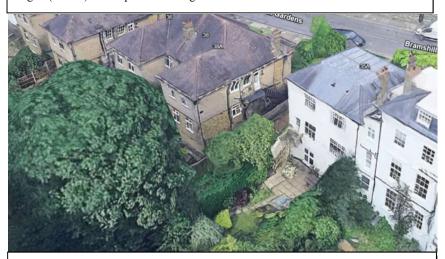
(Above) Aerial photo showing the rear elevation and relation to neighbouring dwellings either side.
